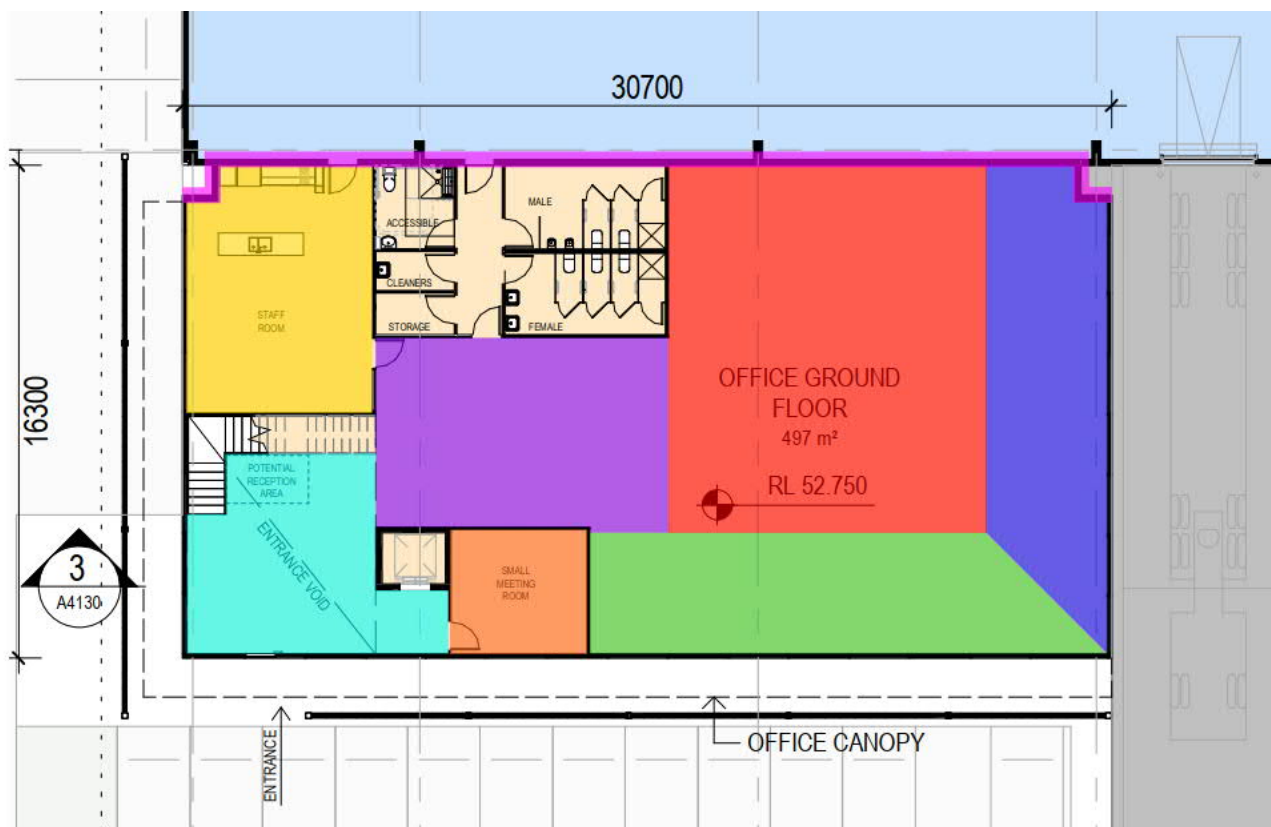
HVAC zones & thermal envelope for 5 McLaren Drive Ground Floor
